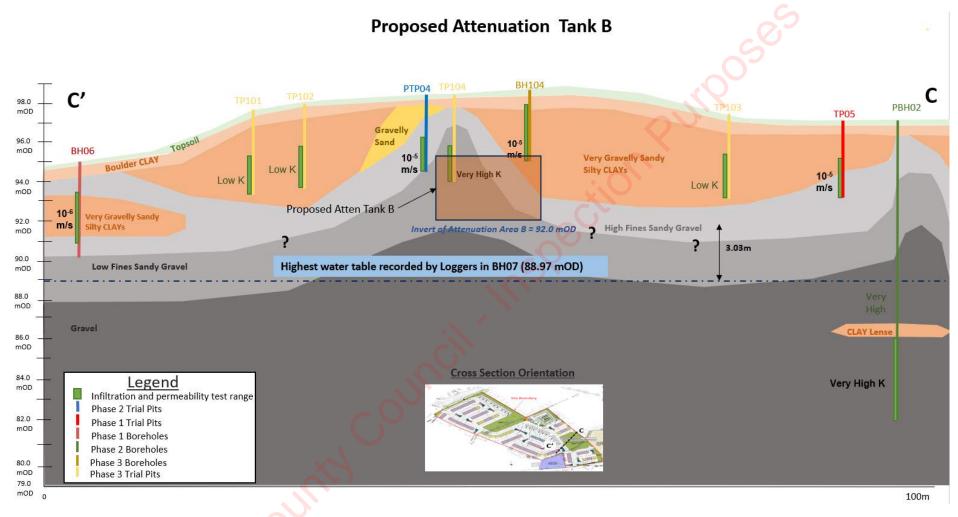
Proposed Attenuation Tank B Cross Section (C' – C)
